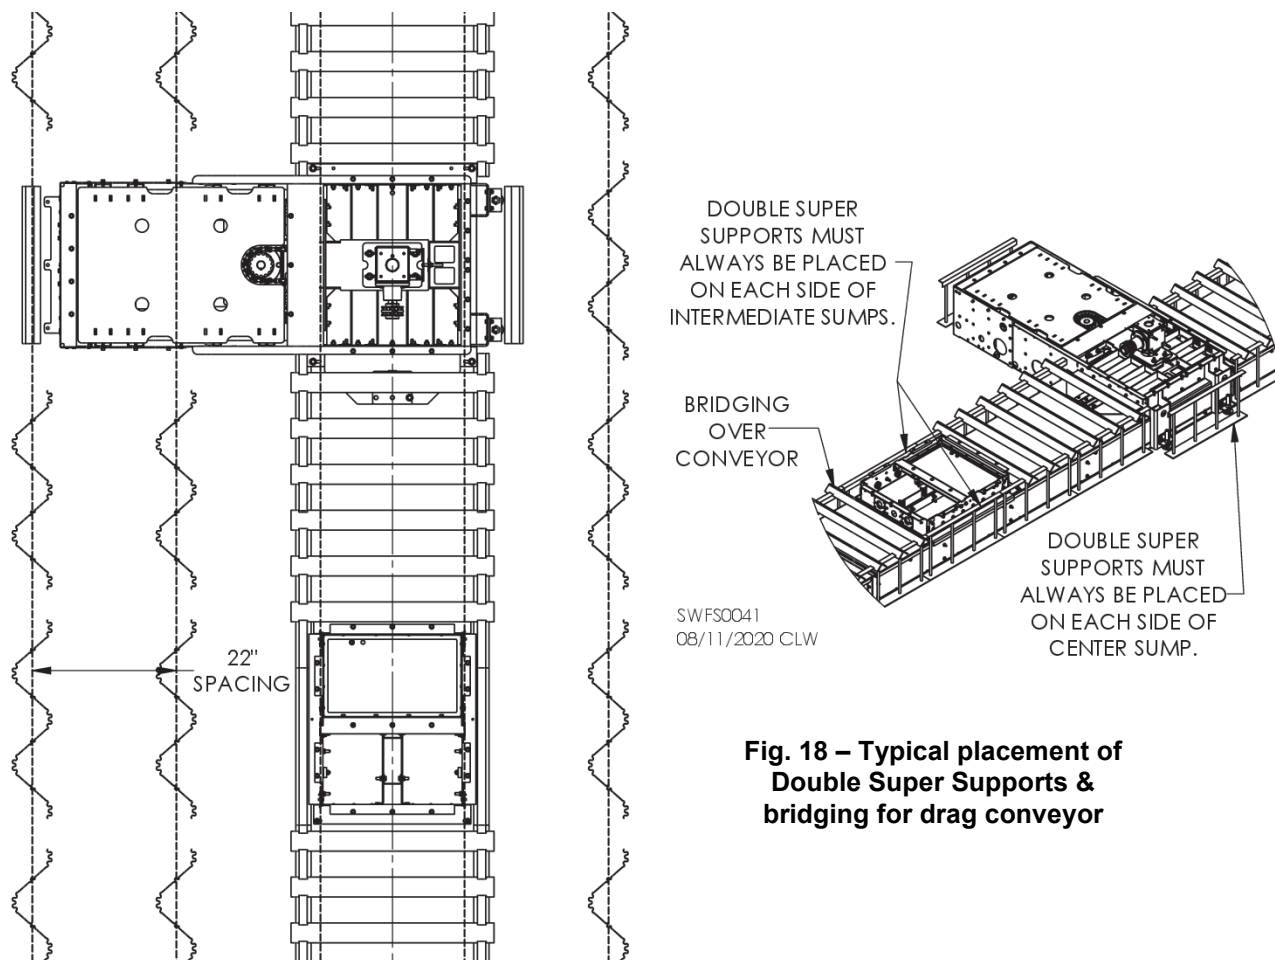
Typical placement of Double Super Supports & bridging for drag conveyor
